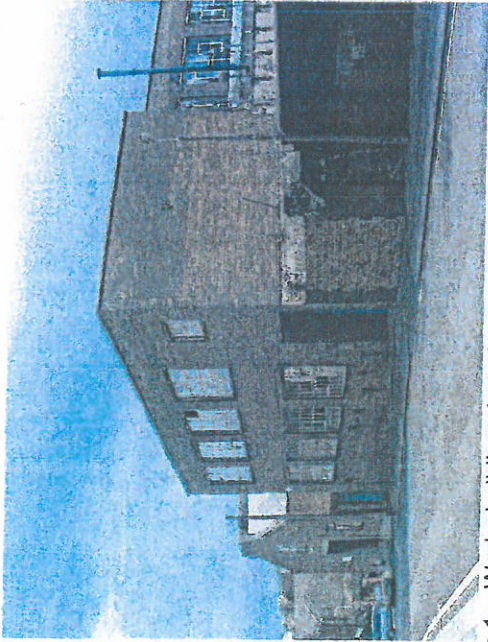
Works building, Area A, viewed facing SE on Garden Street
